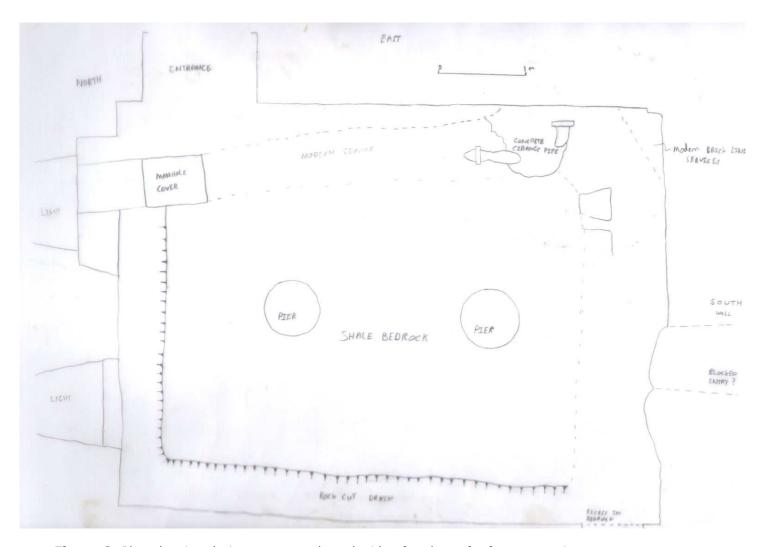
Plan showing drain on west and north side of undercroft after excavation.
